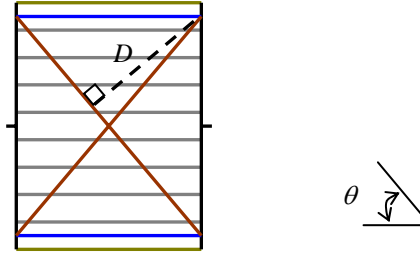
Area of diagonal concrete strut in the plastic hinge element
